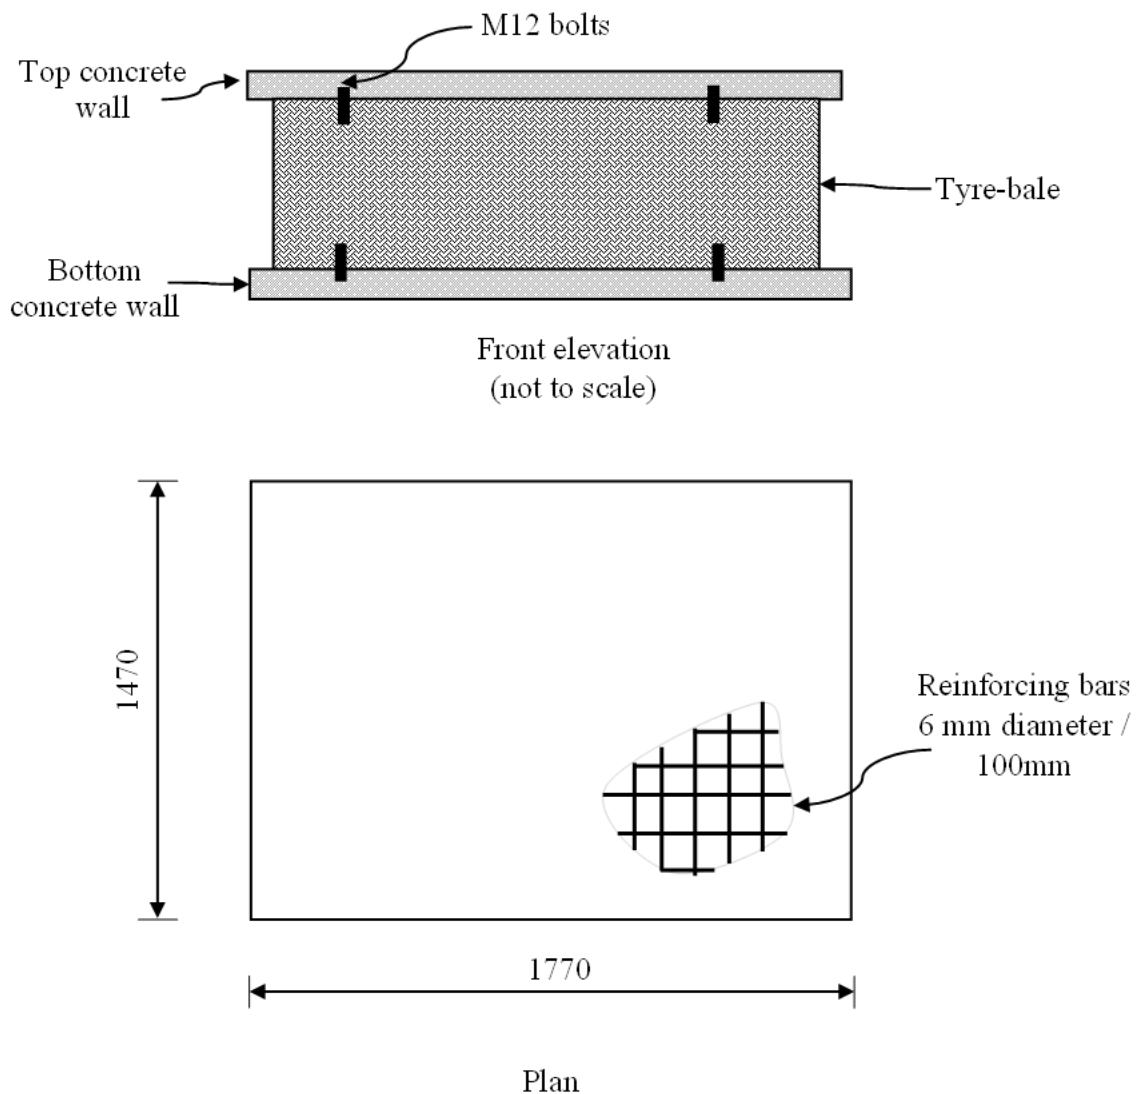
Details of tyre-bale sandwich wall (all dimensions are in mm)
